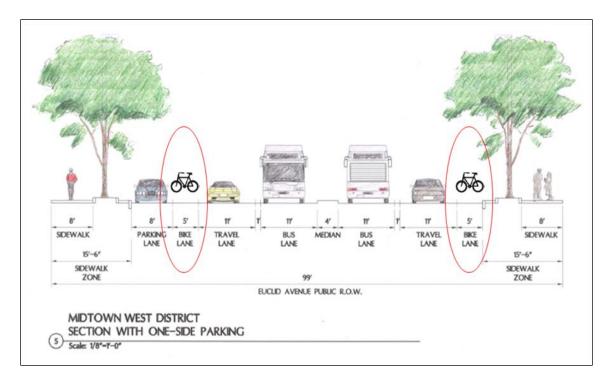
Cleveland's road and sidewalk elements and their lengths (Schipper, 2008).
